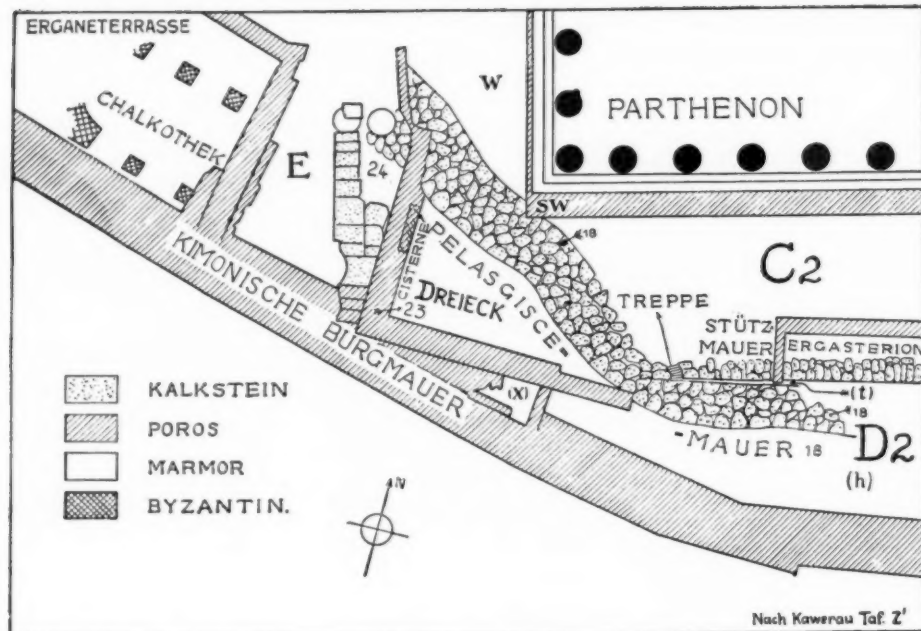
PLAN OF EXCAVATED SECTORS SOUTH OF WEST PART OF PARTHENON
